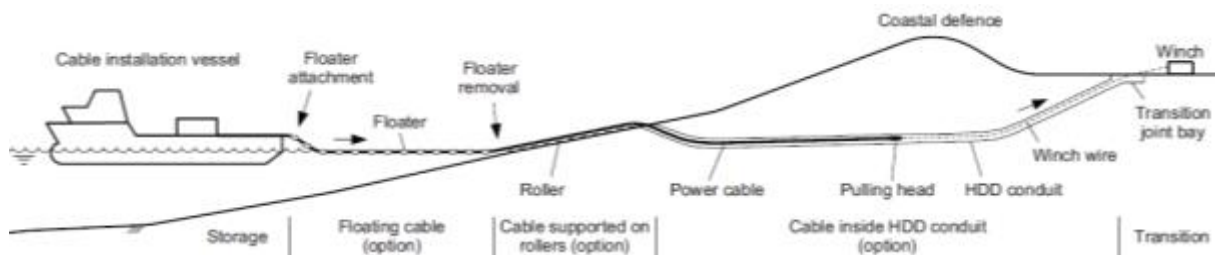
Cable pull-in. (DNV GL AS, 2014)
